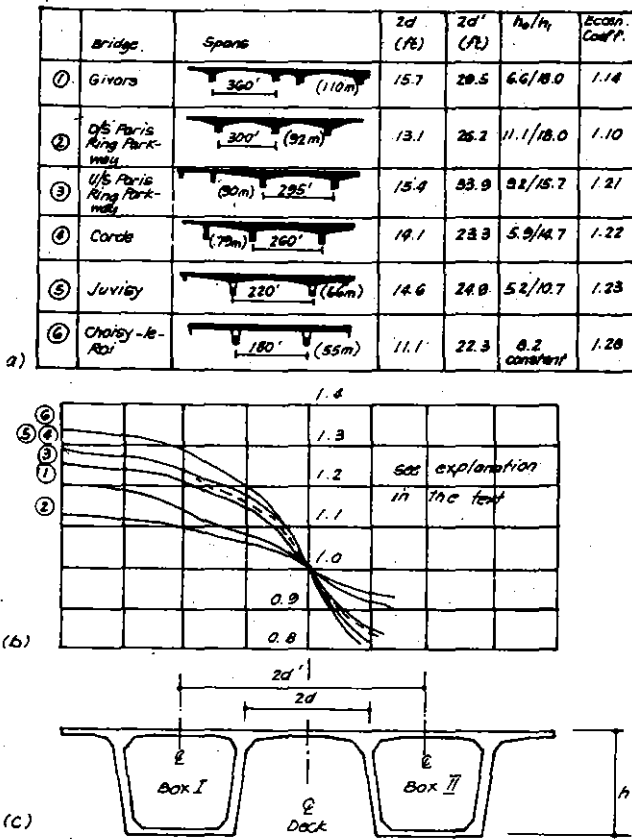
Transverse distribution of loads between box girders, numerical values for several two-box girders marked 1 to 6
